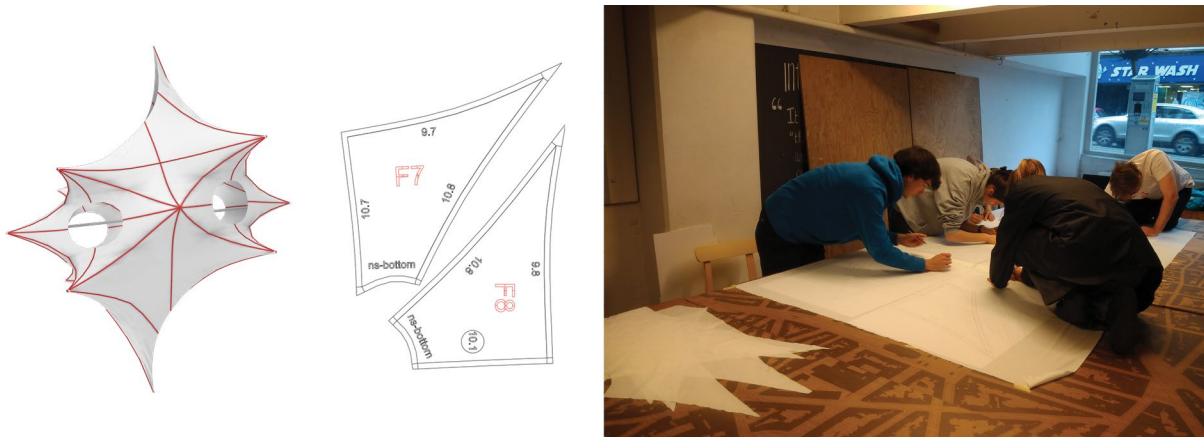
Marked seams on the 3d model (left), 2d drawings of unrolled fabric patches (centre), tracing and cutting process (right)
